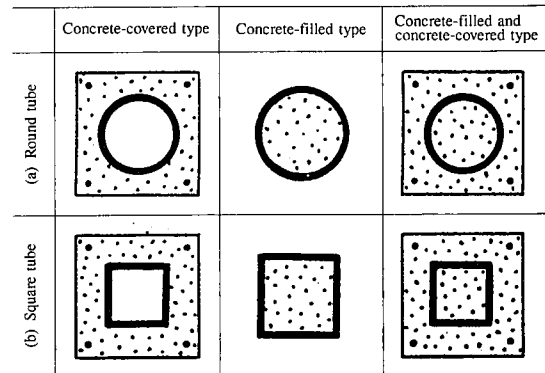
Cross-sectional shapes of concrete-tube composite columns
